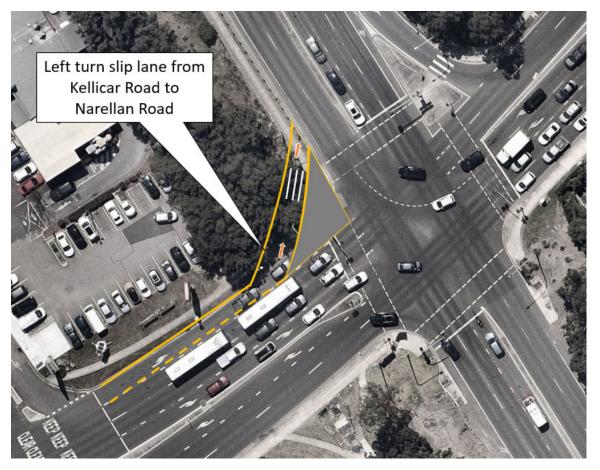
Proposed mitigation at Kellicar Road / Narellan Road intersection
